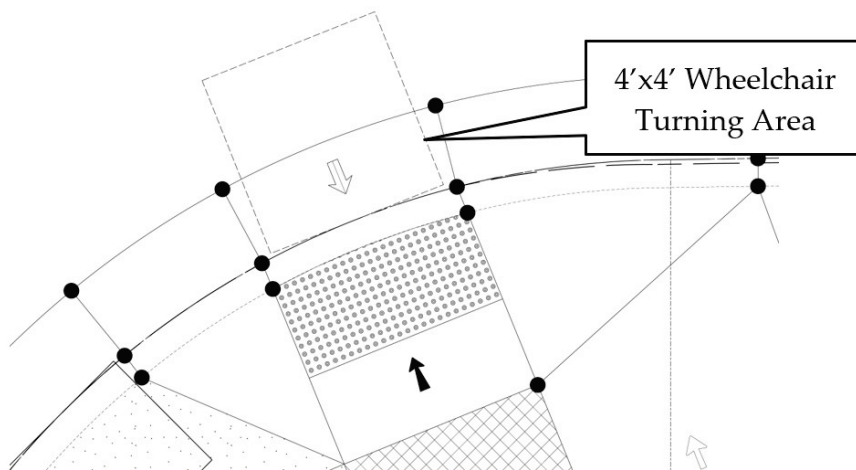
Typical Curb Ramp Pattern and Hatch Examples
